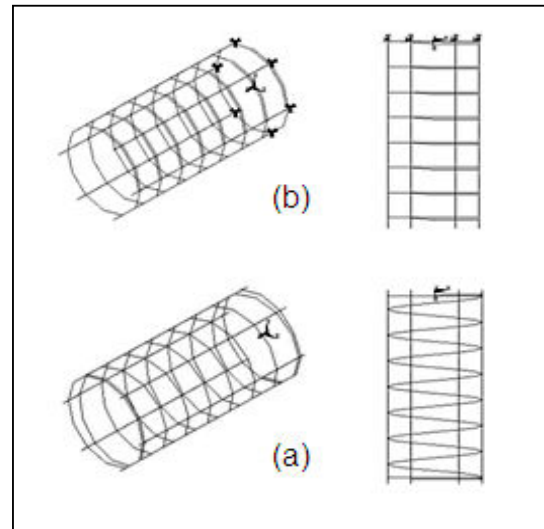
The way of reinforcing concrete core: a) with spiral links, b) with ties
